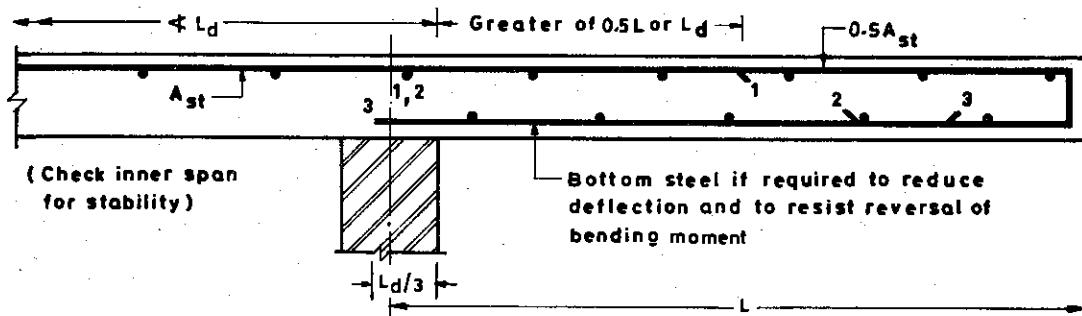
Layout of reinforcement in cantilever slabs.
